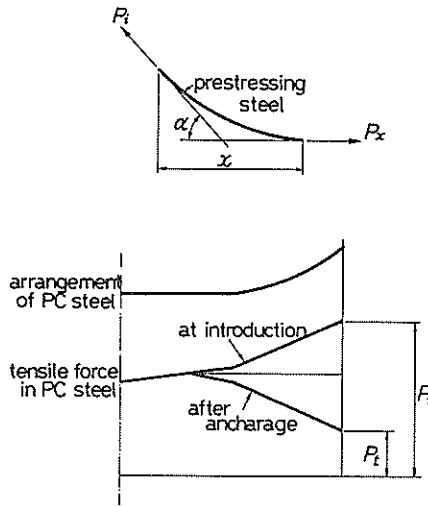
Friction between Prestressing Steel and Sheath, and Tensile Force in Prestressing Steel at Anchorage
